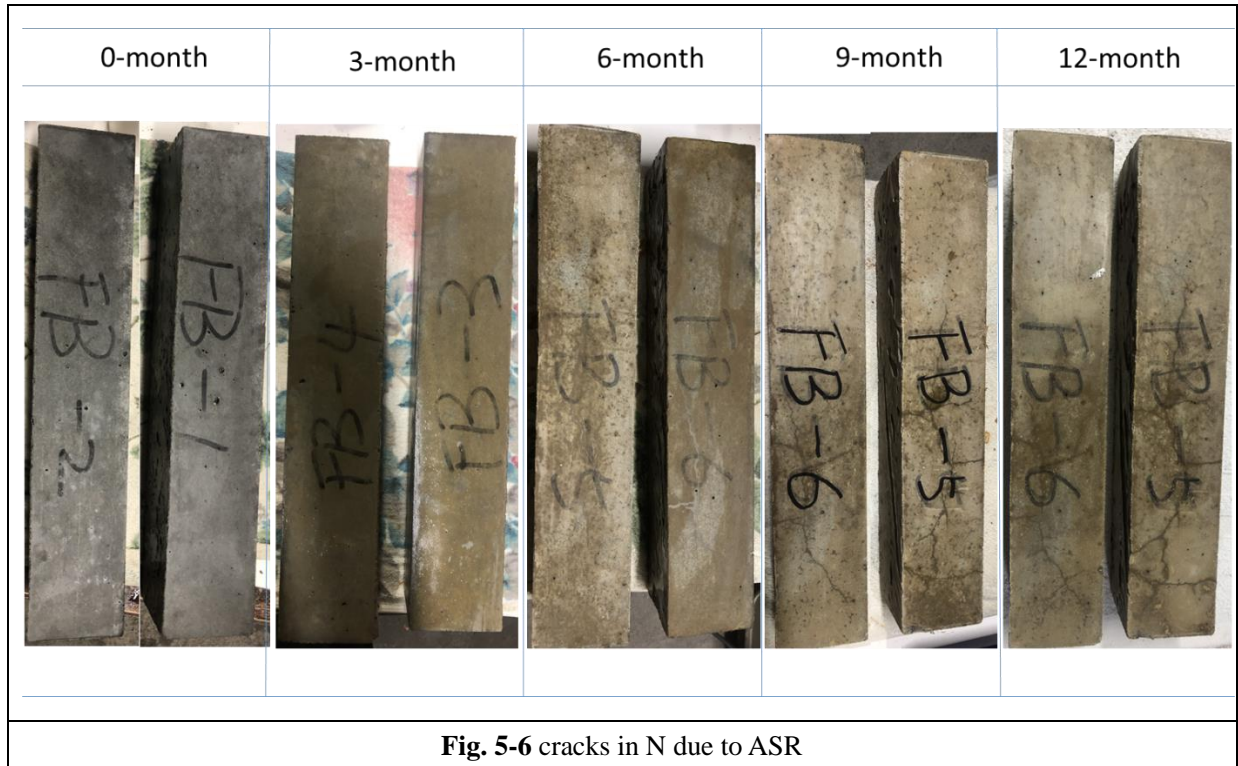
and Fig. 5-6 show the cracks progression in AB-FB and FB due to ASR time. For the AB-FB, little crack was caused in the concrete surface. While for FB, since 9-month concrete cracked. Comparing the cases between BFS and FB, FB can make concrete have a better ASR crack resistance than BFS.
